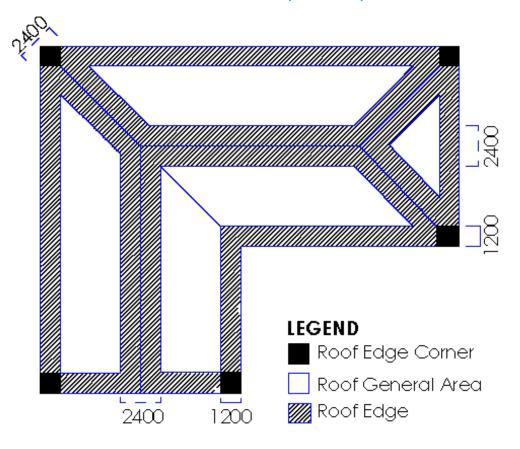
PRESSURE ZONES ON HOUSING ROOF (PLAN VIEW)
